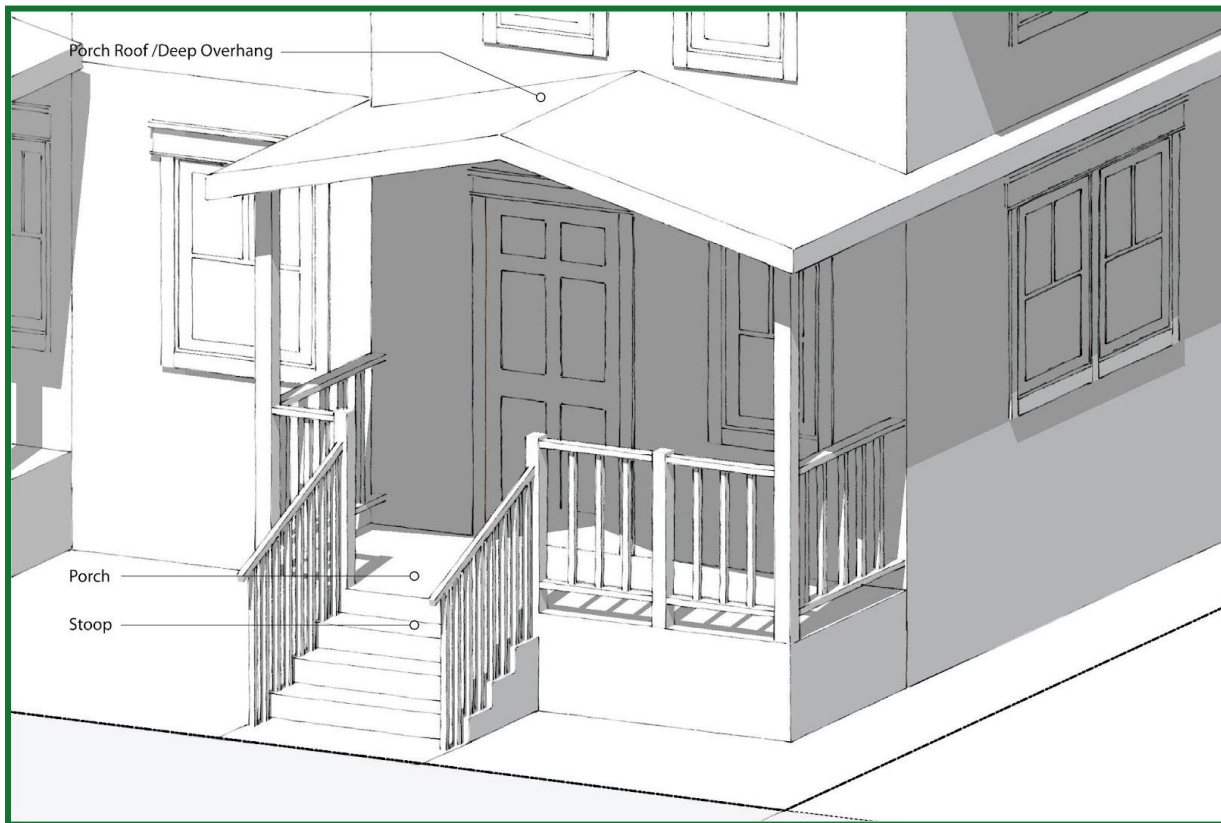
BUILDING DESIGN – TOWNHOUSE DEVELOPMENT
